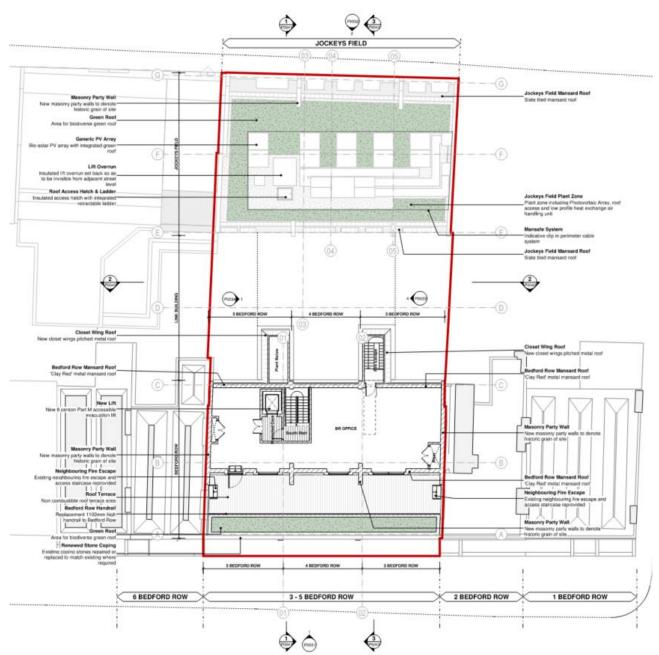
Proposed fourth floor plan showing area for biodiverse green roof (shaded green)
